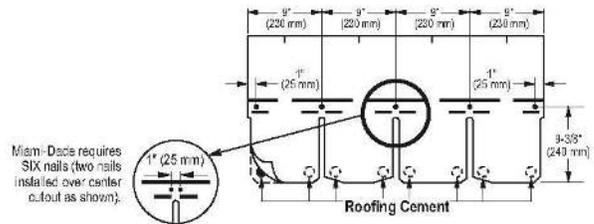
A: Use FIVE nails and eight spots of asphalt roofing cement under each tab corner.
